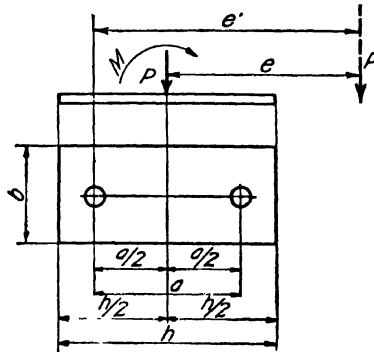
Layout of Base-Plate and Anchor Bolts.
